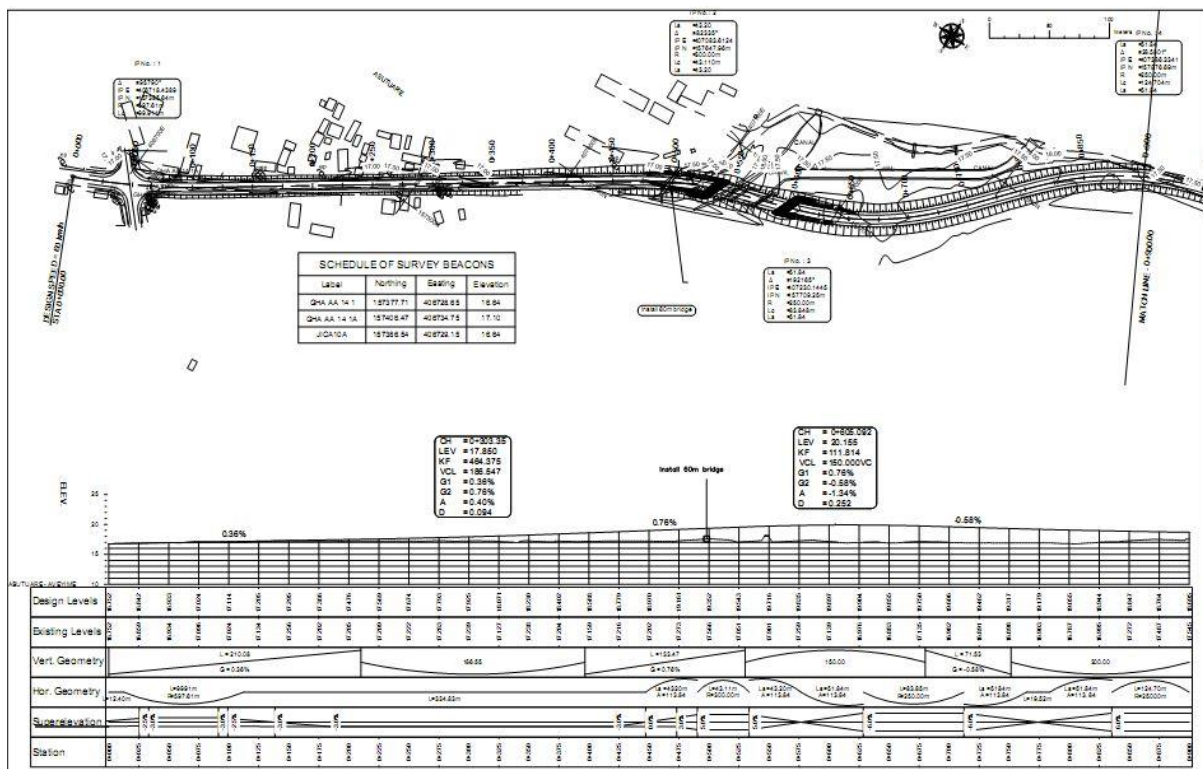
Sample Plan and Profile of Asutware – Aveyime Road (Section 2 Project Road)
